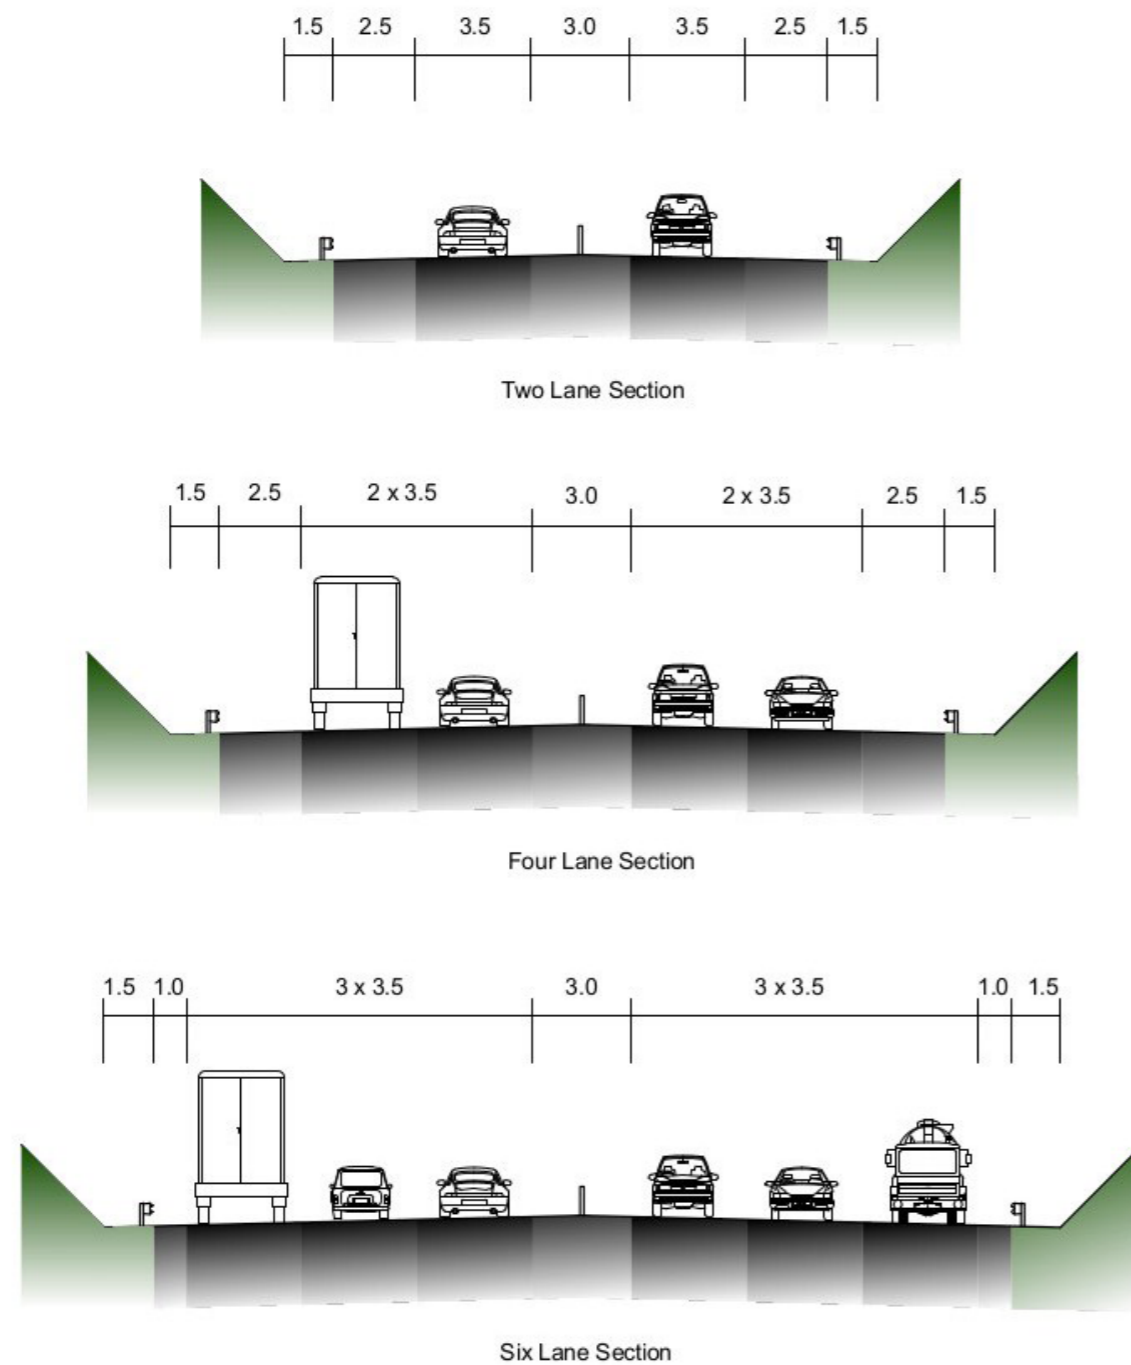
Proposed Minimum Carriageway Cross Sections
